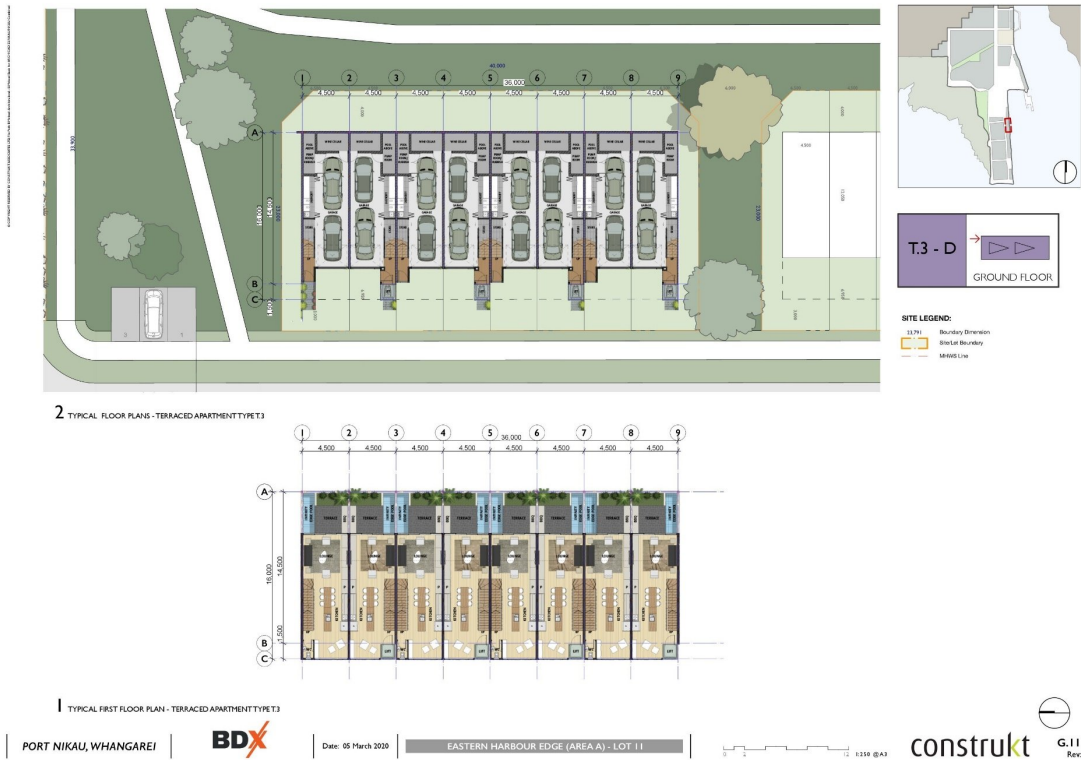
Part G – Eastern Harbour Edge (Area A) Floor Plans
